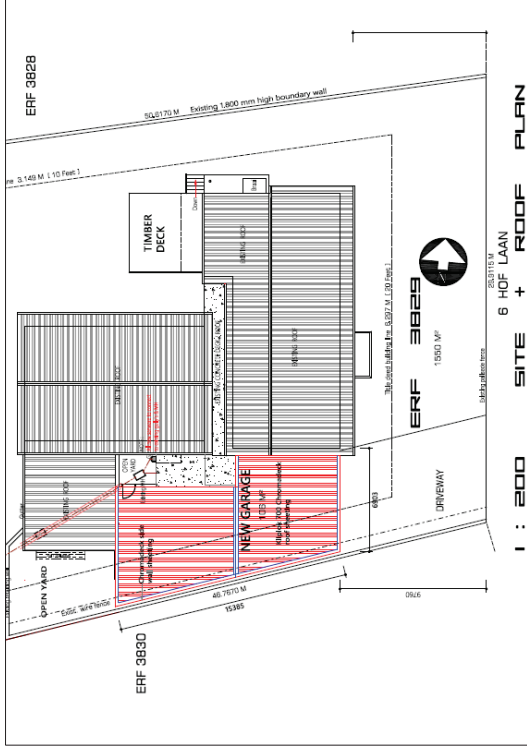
Proposed garage on Erf 3829 (Site Plan)
